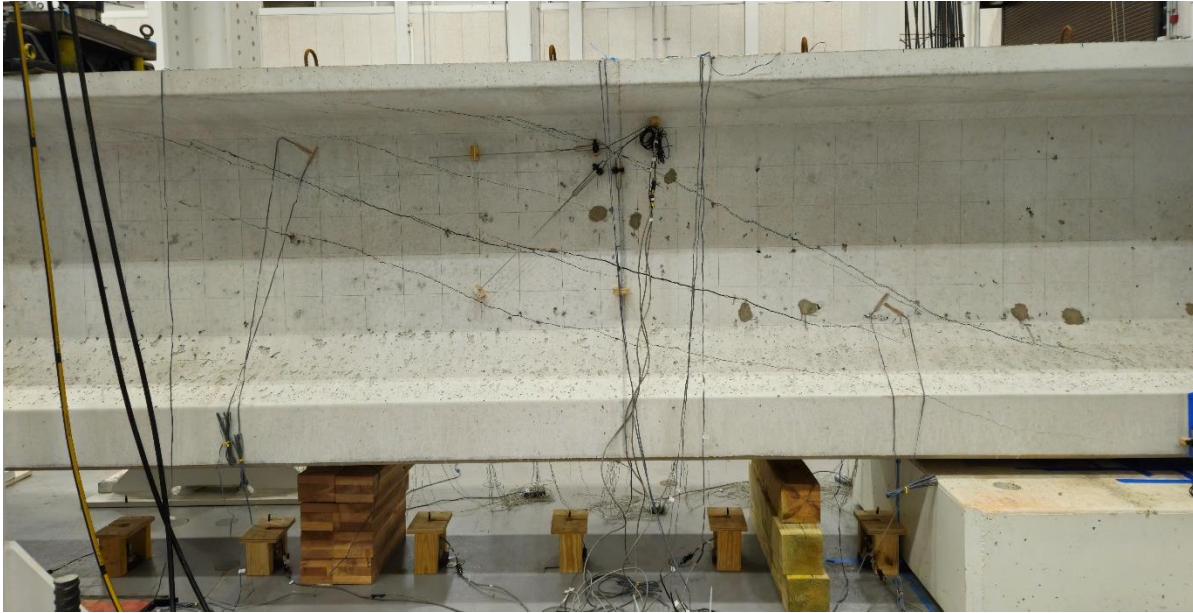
East side of G5 girder at cracking load.
